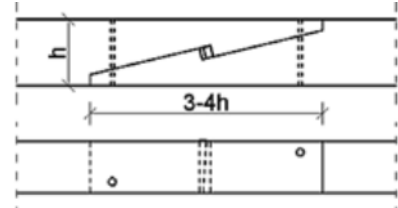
Removed floor joist end replaced by timber supported from masonry wall in Prague year 2007 [22, p. 69].
